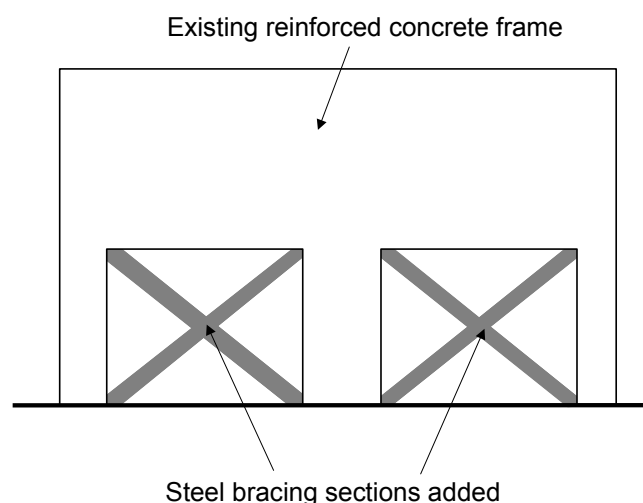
Steel Bracing for Reinforcing Concrete Frames without Proper Seismic Resistant Design
